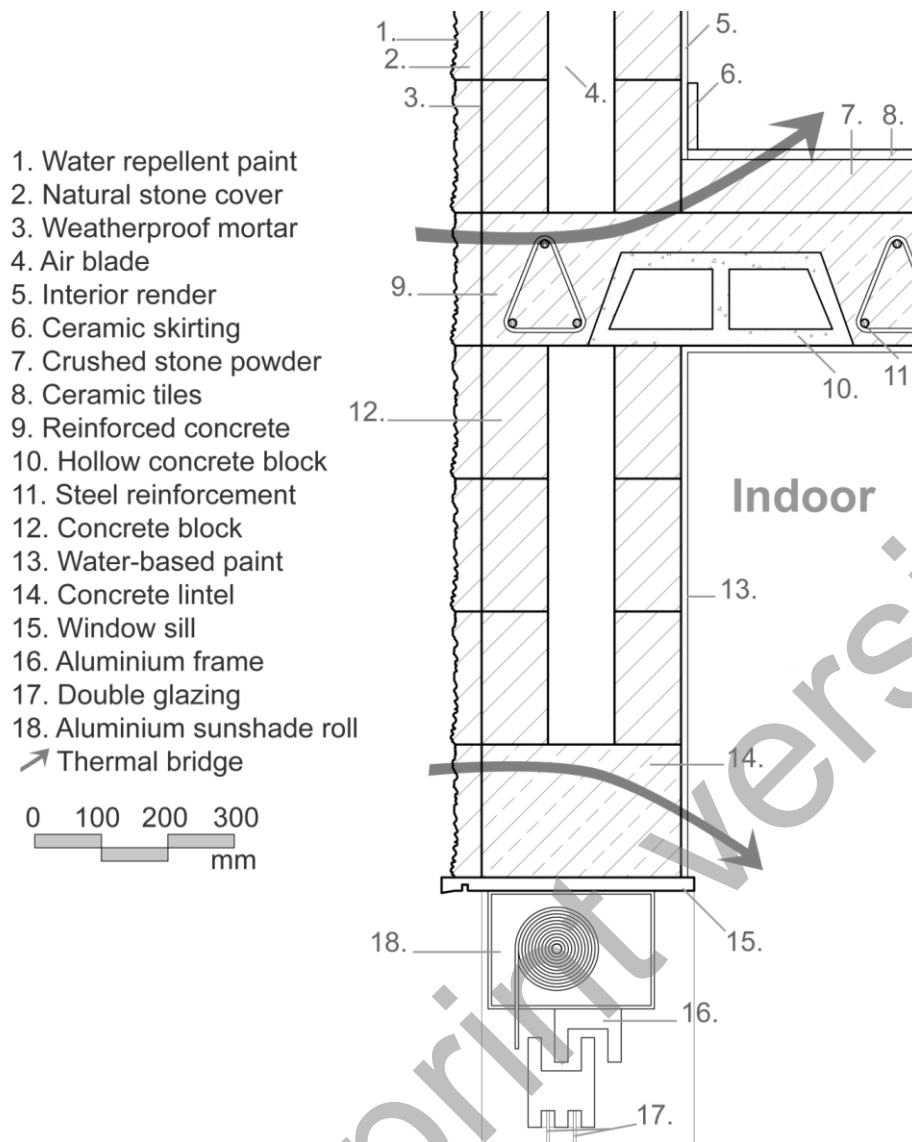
Wall-slab junction detail of the case study apartment building in Sehaileh, Lebanon
